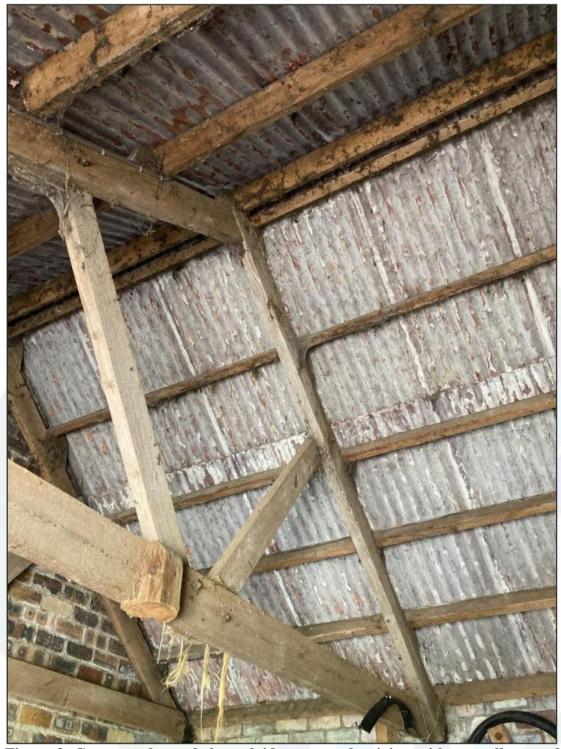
Corrugated metal sheets laid onto wooden joists with no wall or roof cavities present.
